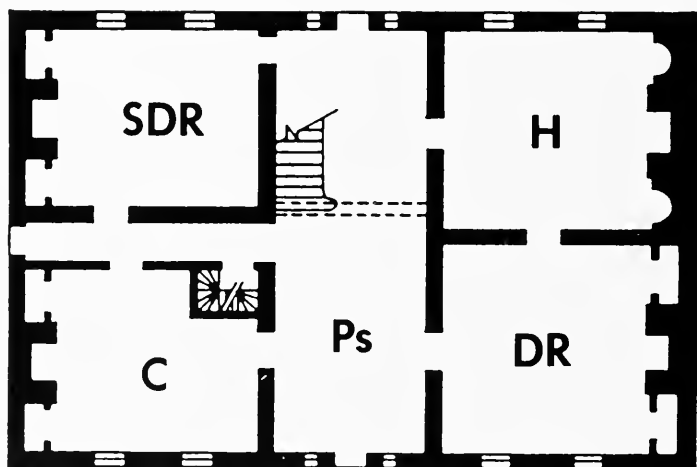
Floor plan of Gunston Hall. Drawing provided by Mark R. Wenger, photograph by Hans Lorenz. In this floor plan, the public rooms are concentrated on the south or right side of the house. Compare this with the plan of the Nelson House in fig. 20 where the public rooms are located on the entrance facade.
